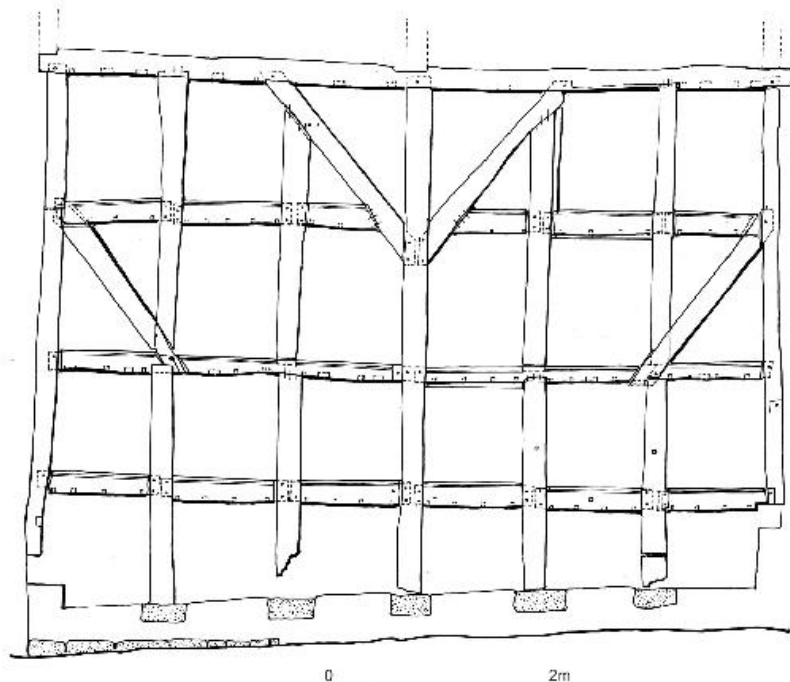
No. 41a Bridge Street: the north elevation, as recorded before restoration. The square framing with odd bracing present at this late stage in its history bears little relation to what was first built (compare [Fig. 2.35](#))
